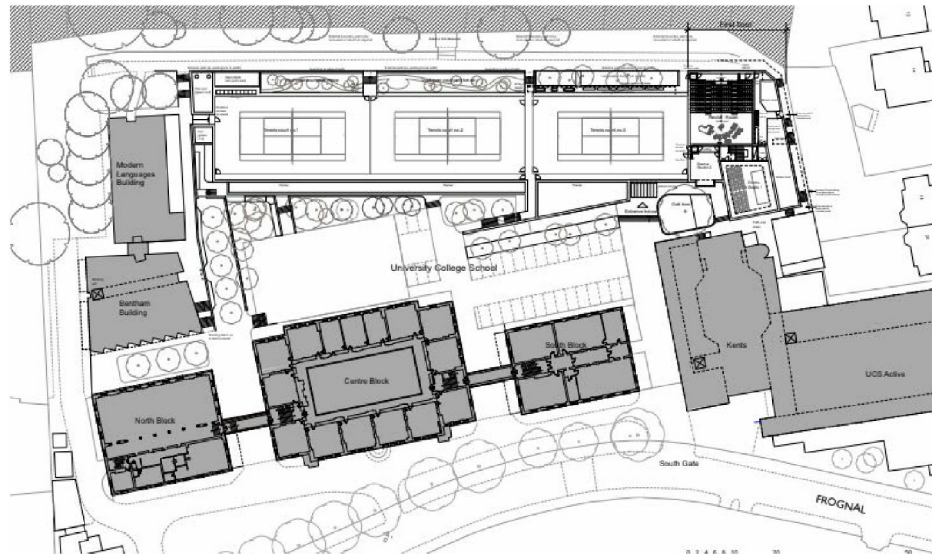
First Floor Plan (Source: Ed Toovey Architects)
